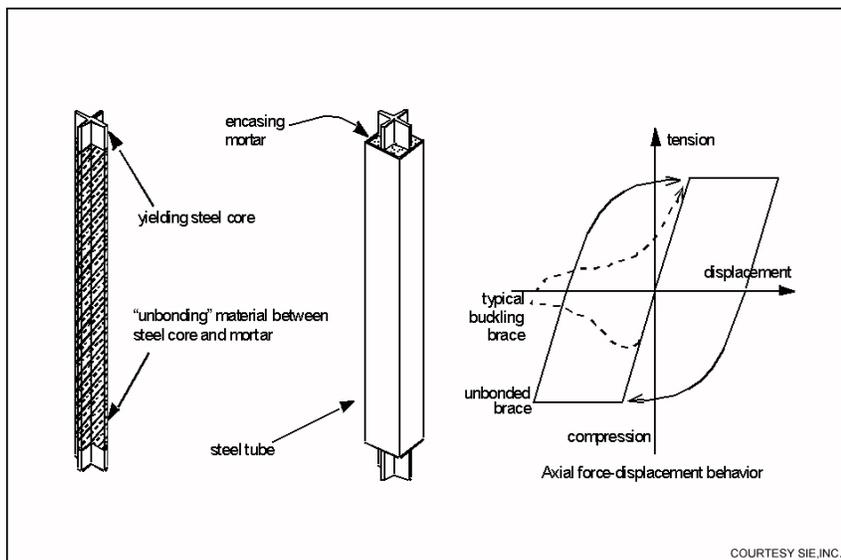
Typical Unbonded Brace Configuration and Behavior.
